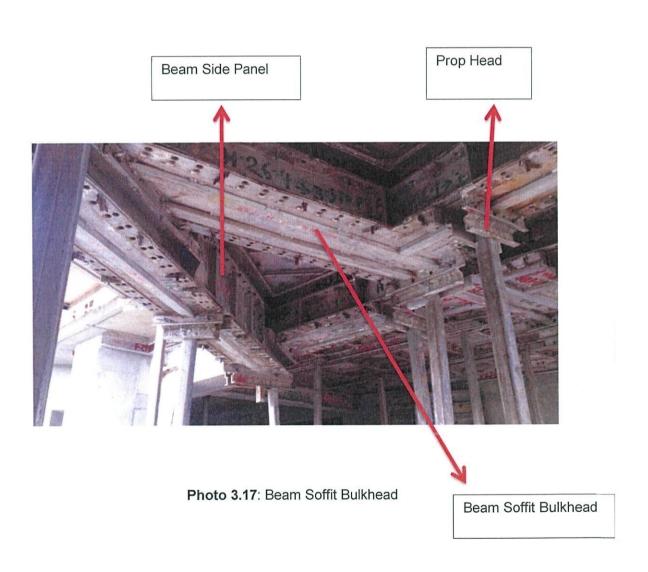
Beam Soffit Bulkhead Source: architectjaved.com (n.d)
